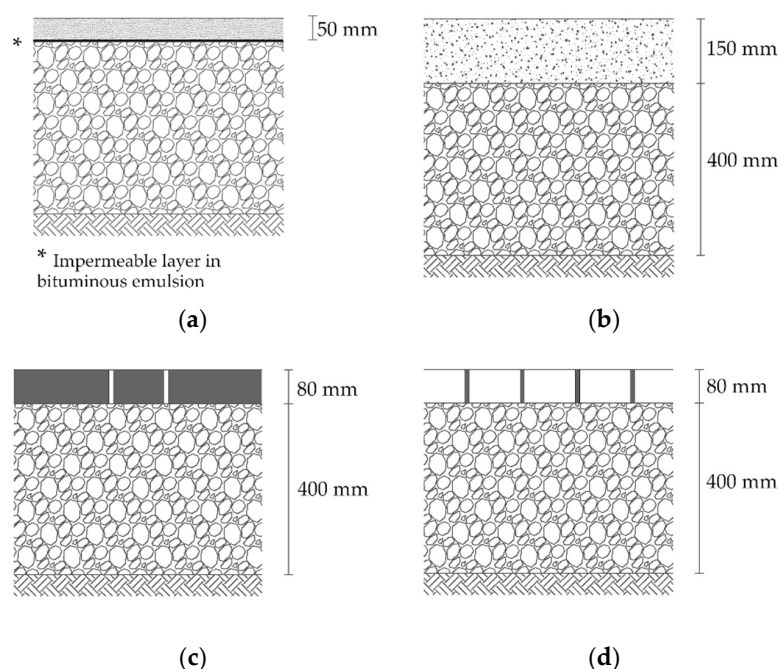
Thicknesses of the layers of each PP: (a) porous asphalt (PA); (b) pervious concrete (PC); (c) permeable interlocking concrete pavement (PICP); (d) grid pavement (GP).
